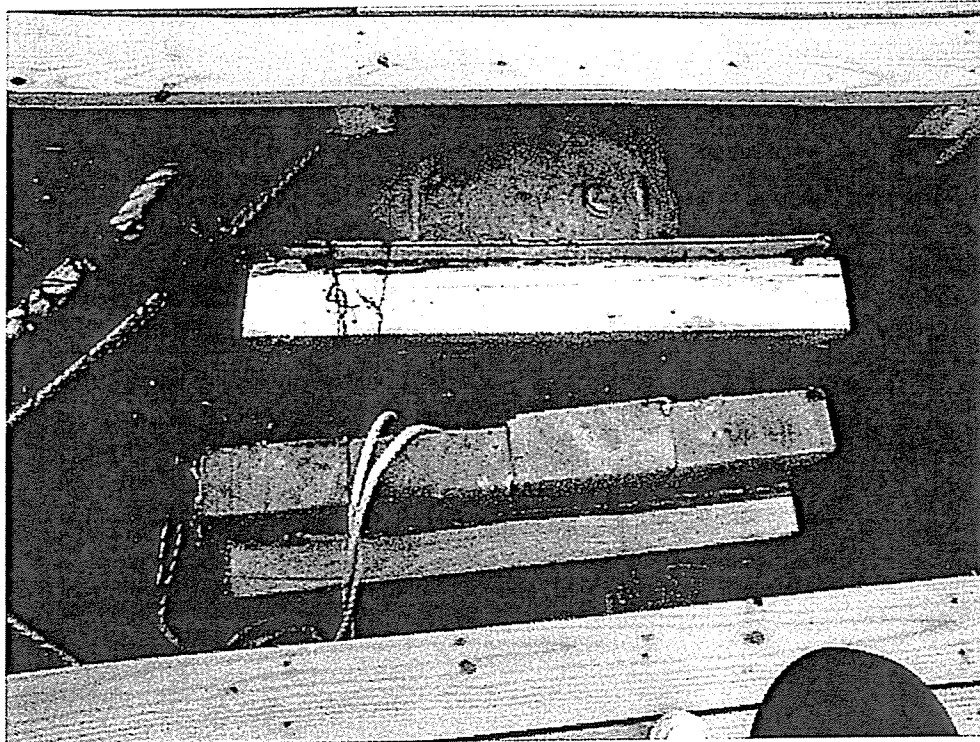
typical connection configuration of floating breakwater/wave attenuator. No positive connection, only lashed together with rope.
